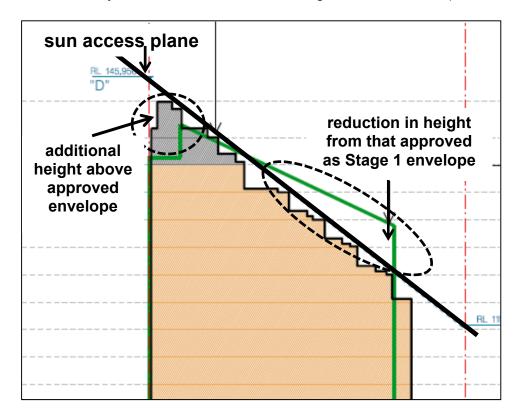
Variations to the maximum height and roof profile of the Stage 1 building envelope to comply with the sun access plane
